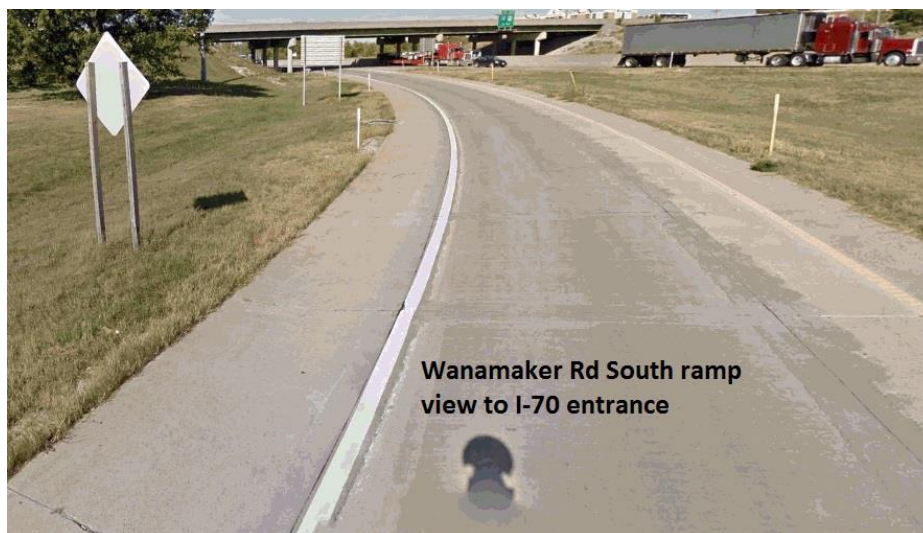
View of the Wanamaker Road South Ramp to the I-70 Entrance
